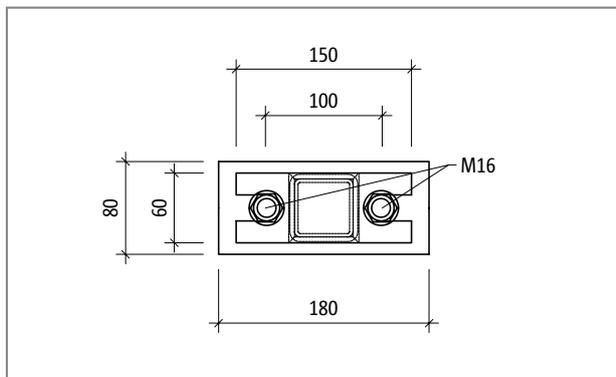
Schöck Isokorb® T type S-V-D16: Product elevation
